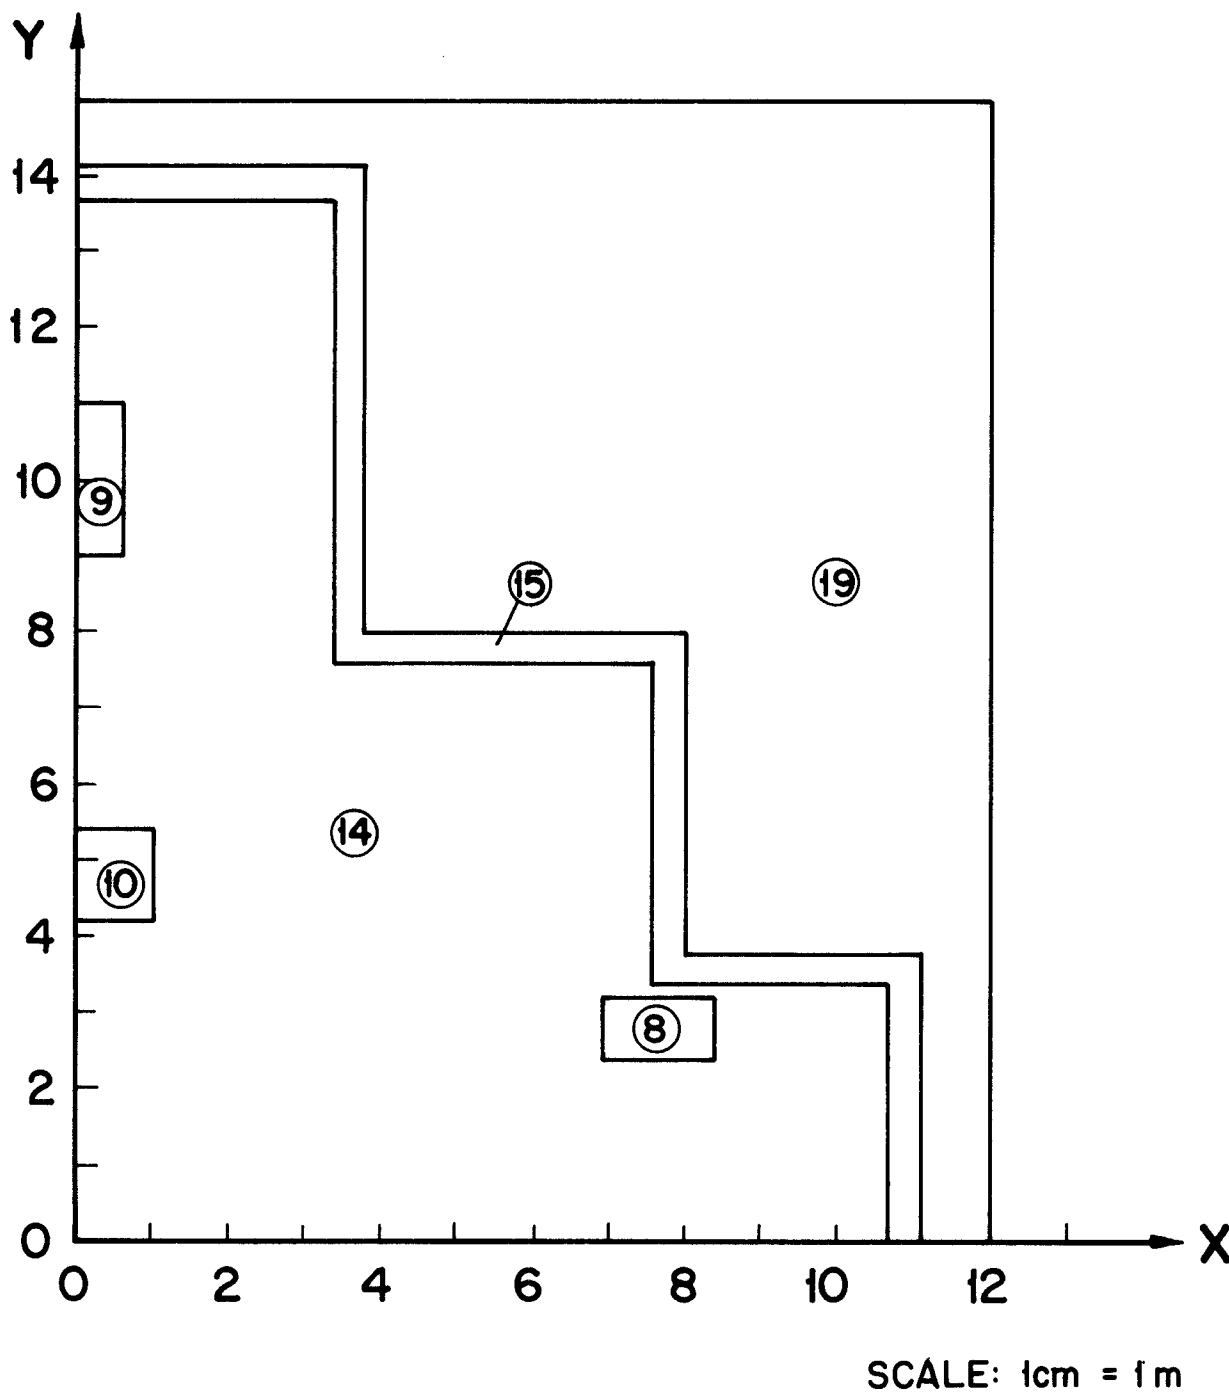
Horizontal cross section at 2.3 m above basement floor.
